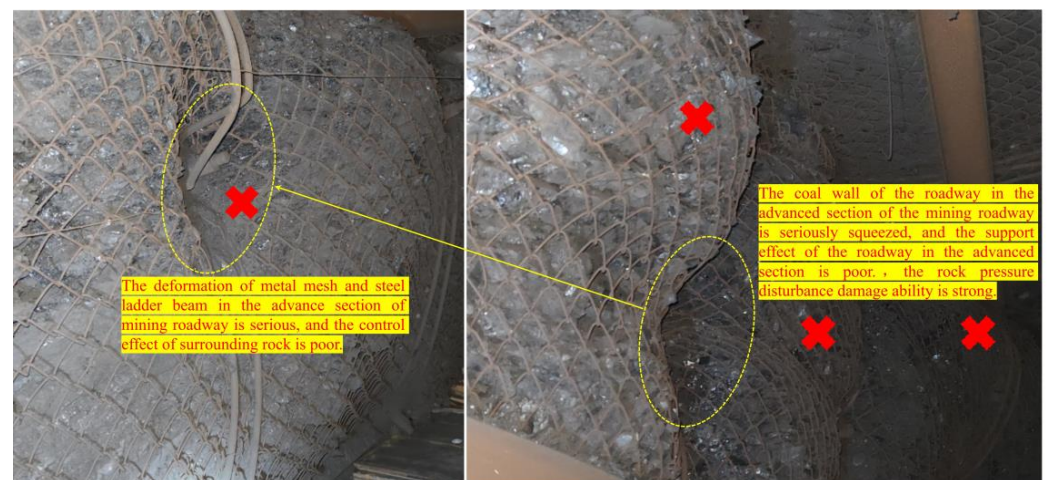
A deformation diagram of surrounding rock support of mining roadway in an advanced section.
